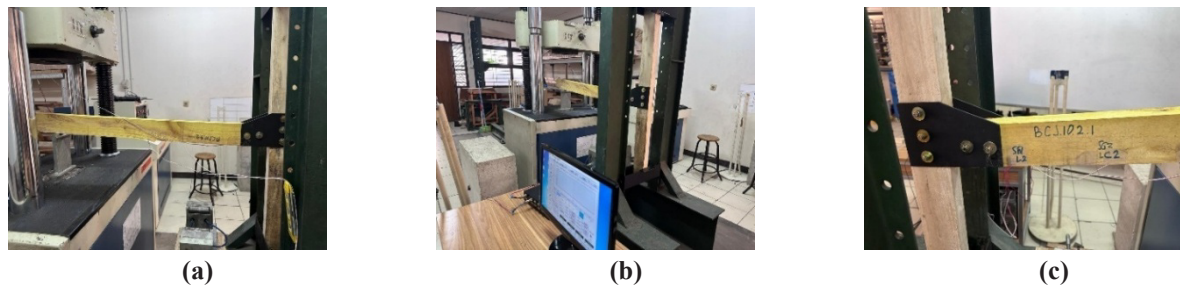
Setup, Testing, and Post-Test of the Beam-To-Column Specimens Using 10 mm Diameter of Bolt. (a) Setup of the Specimen. (b) Testing of the Specimen. (c) Post Test of the Specimen.
